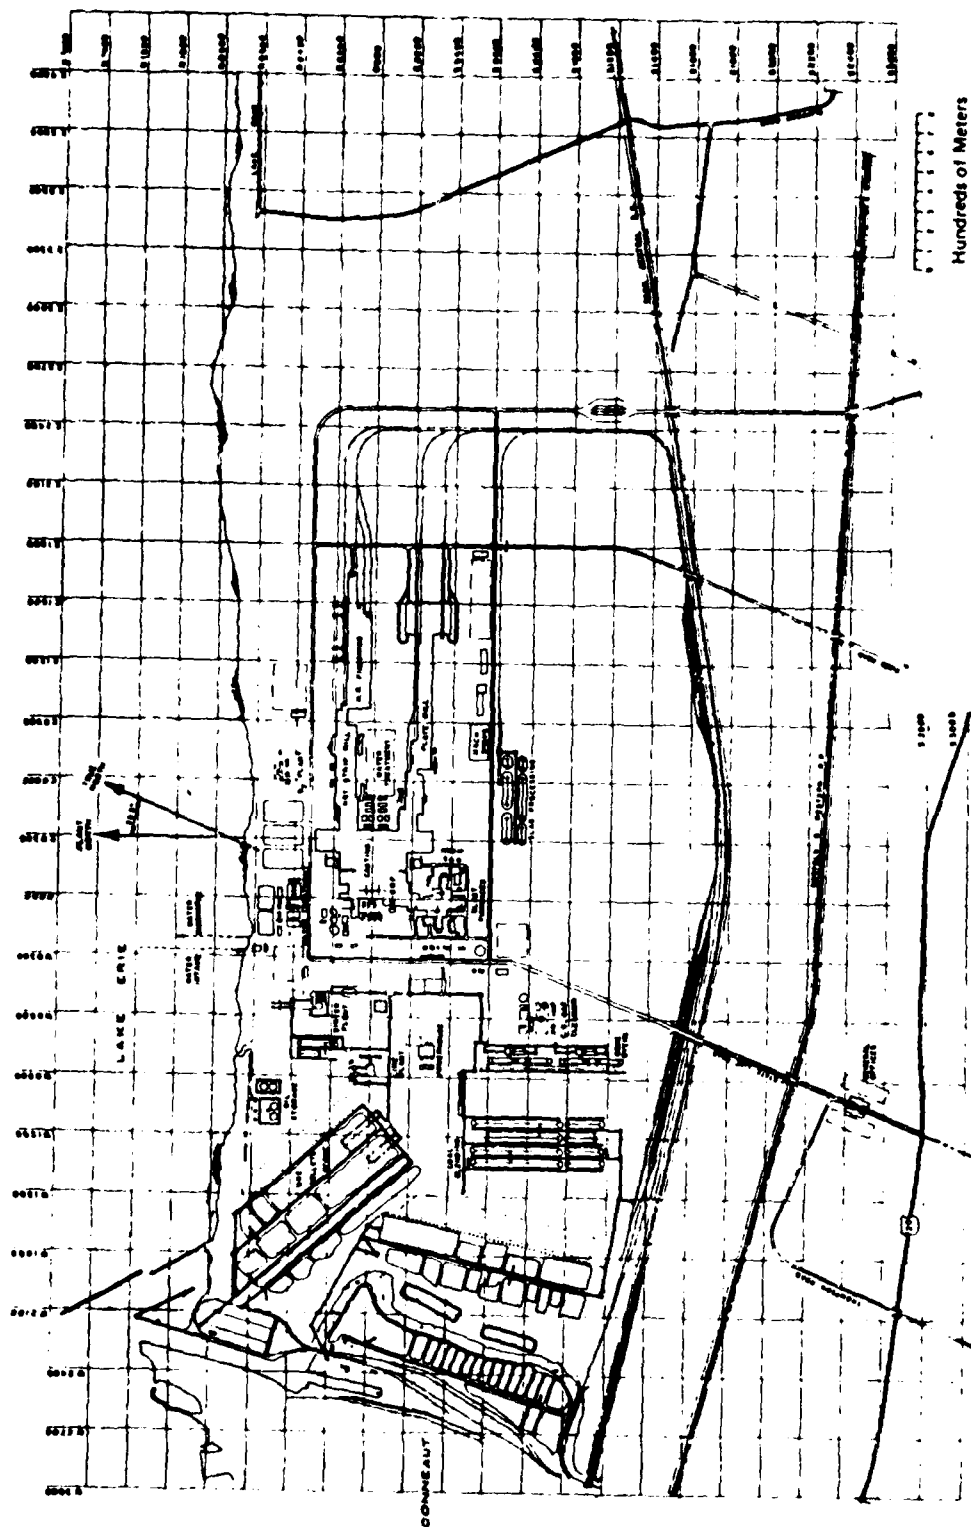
PROPOSED LAKEFRONT PLANT LAYOUT
